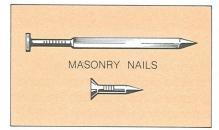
Masonry nails can be driven into concrete or masonry.
